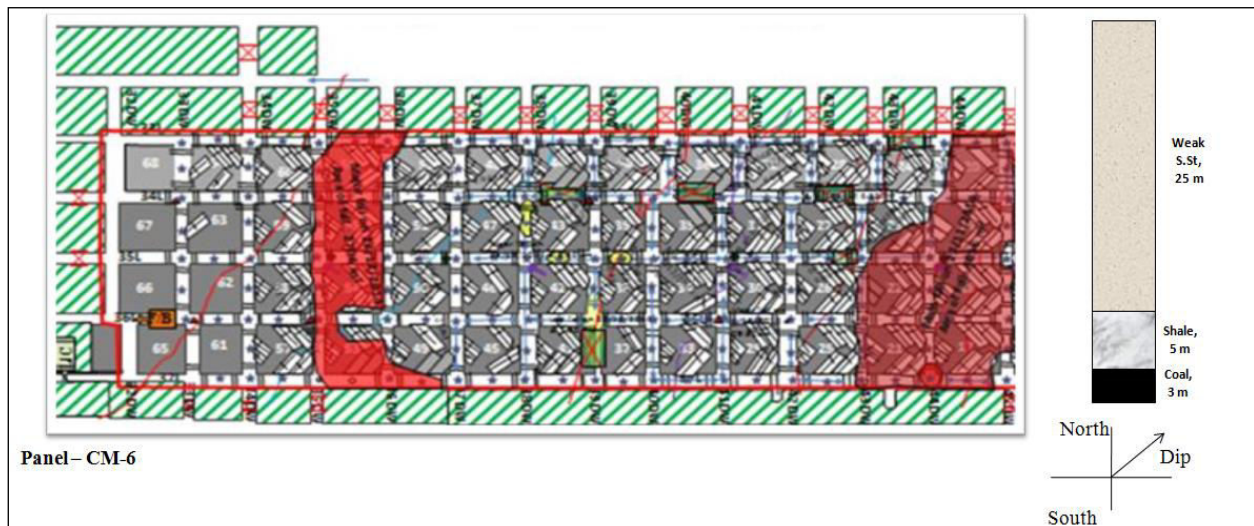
Working plan of CM-6 Panel, Pinoura UG with cross section of roof formations including coal seam.
